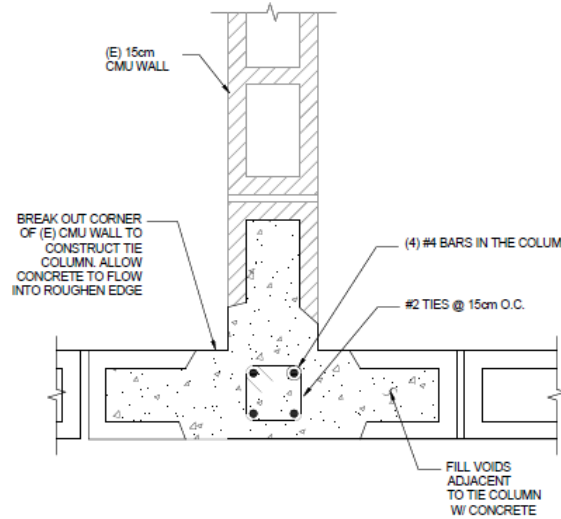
Retrofit detail to install a new vertical confining tie at the intersection of two existing walls
